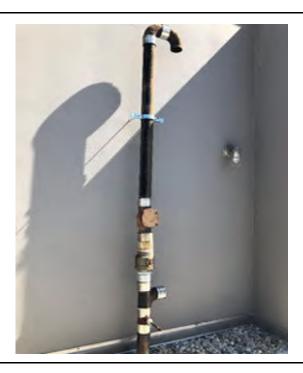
V2 riser in good condition, facing northeast. 8 April 2021.
